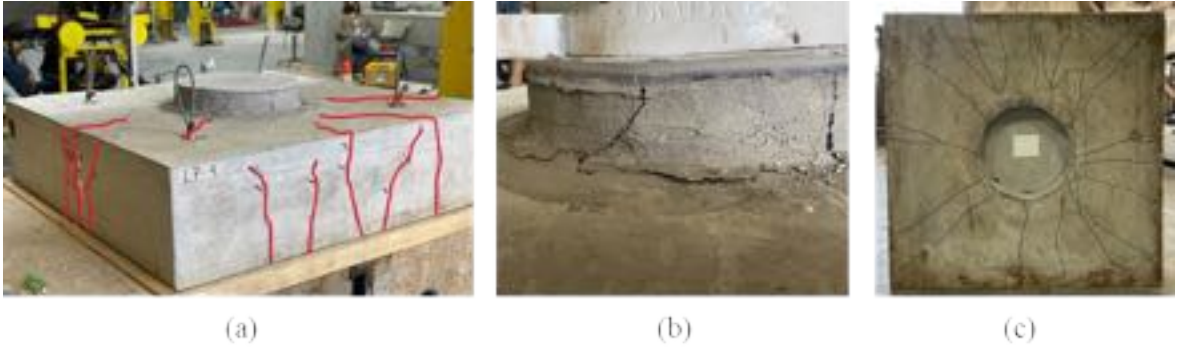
Failure and cracking pattern of Specimen LP-4 (a) south-east view, (b) plug detail, and (c) bottom view.
